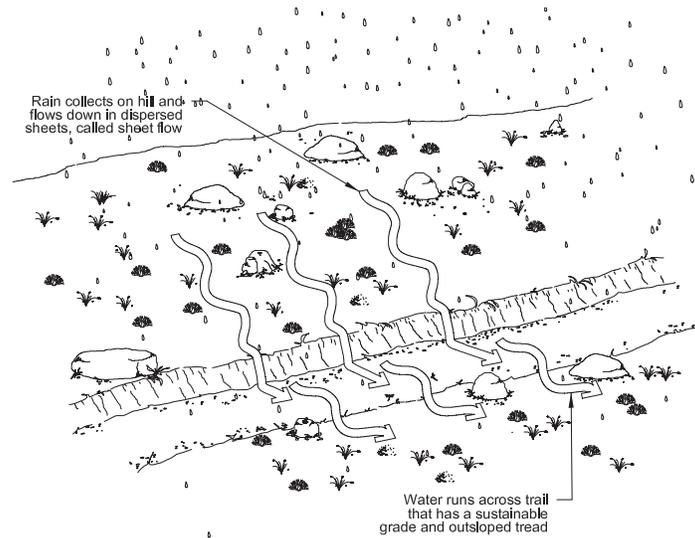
Design elements for a rolling contour trail let water sheet across the trail. Sheet flow prevents water from being channeled down the trail, where it could cause erosion.
